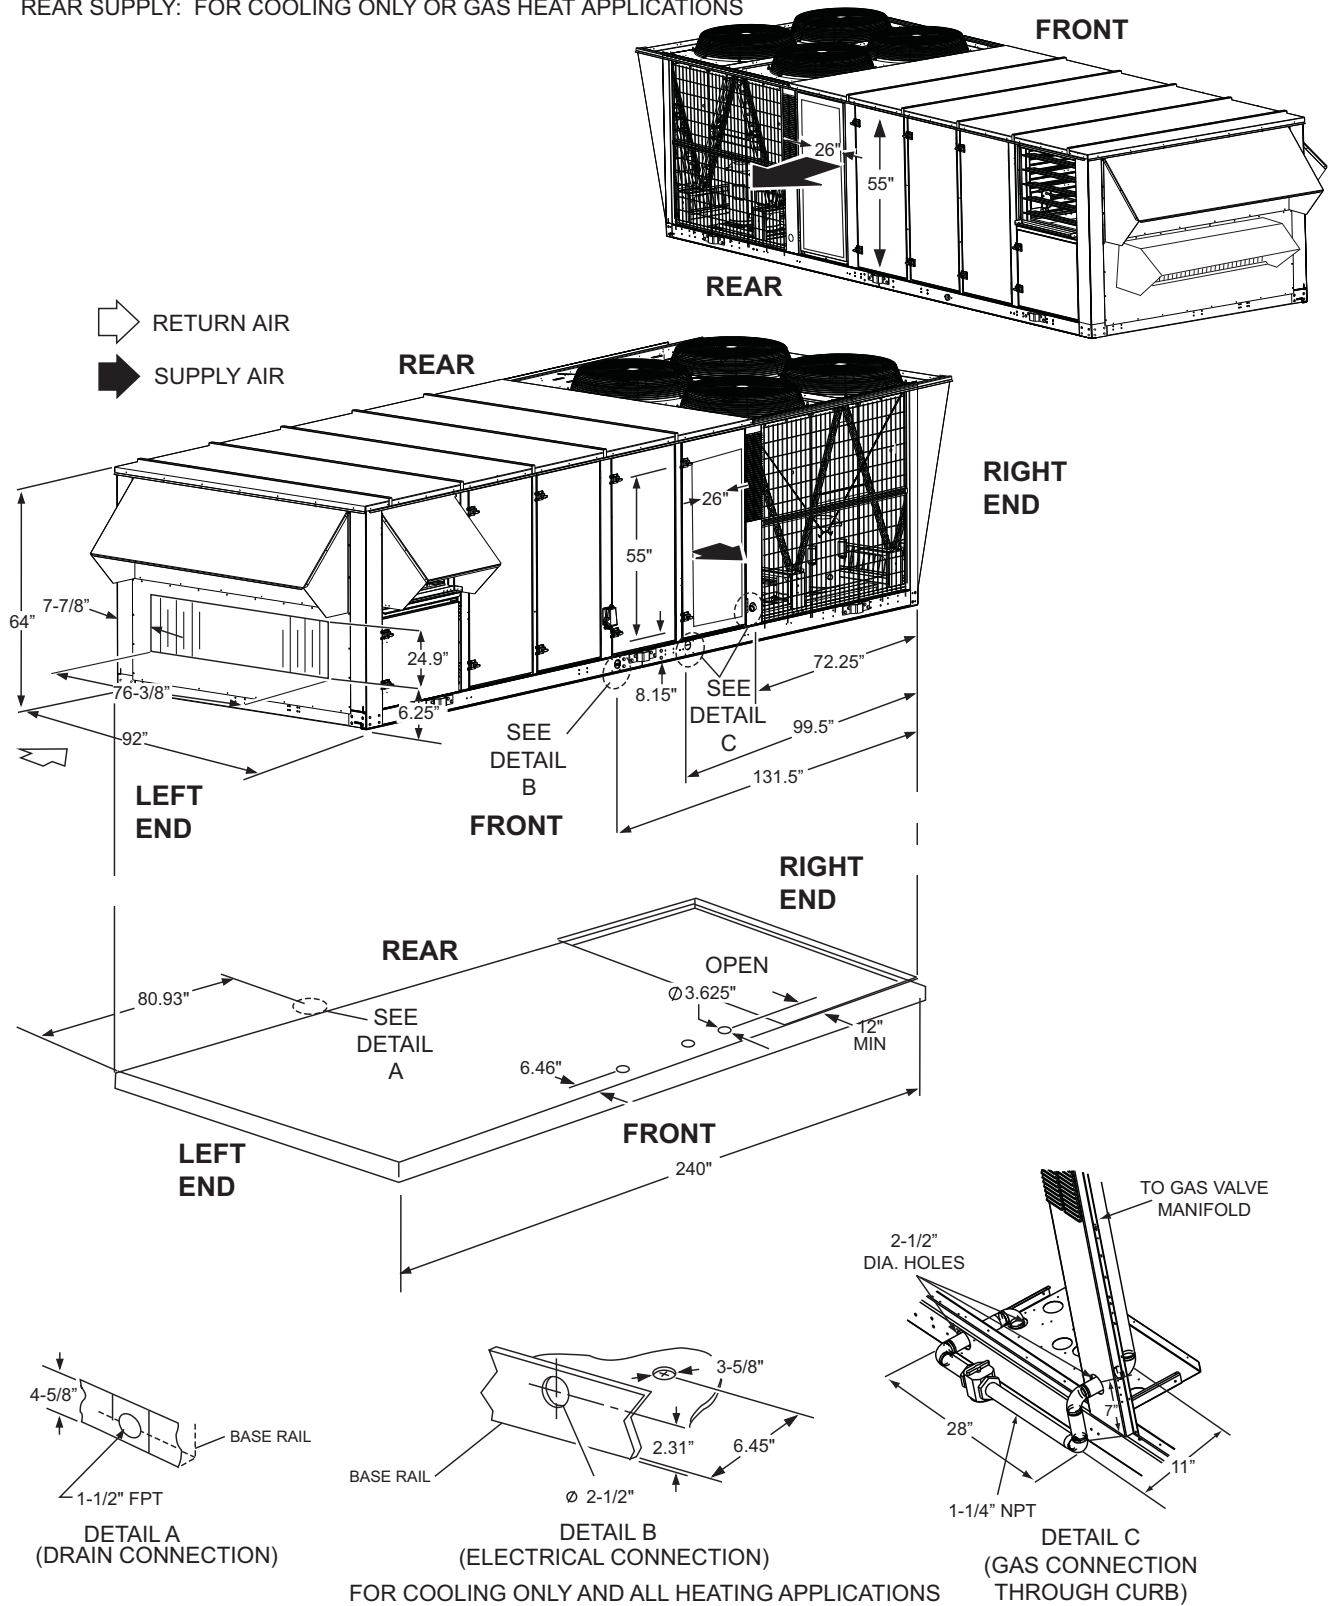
END RETURN, FRONT & REAR SUPPLY
